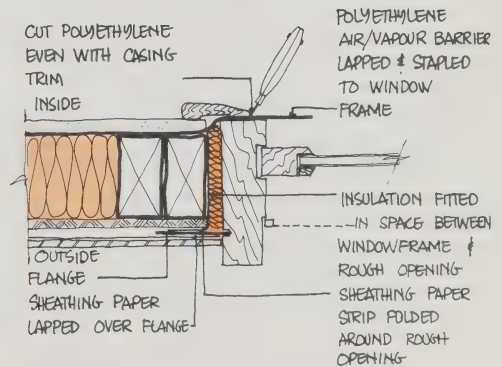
TYPICAL JAMB SECTION ILLUSTRATING MANY FEATURES OF GOOD WINDOW INSTALLATION PRACTICE.
